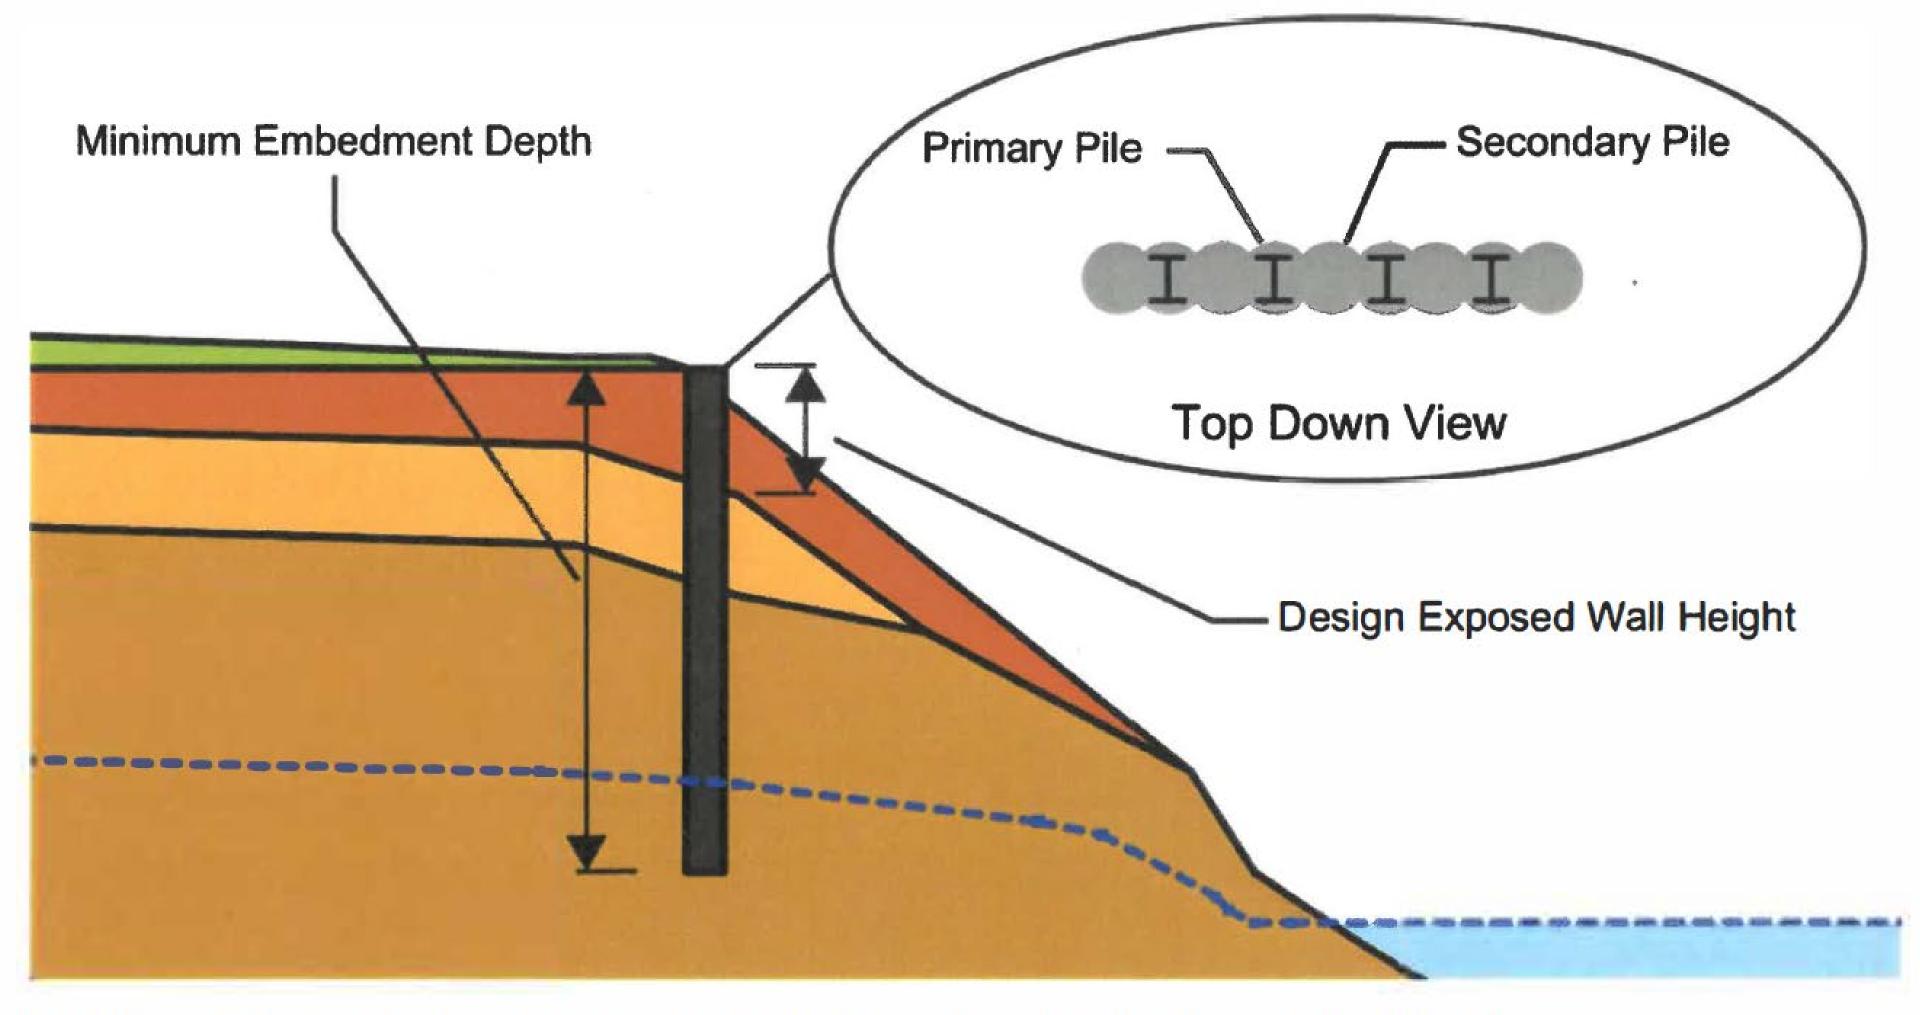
Conceptual rendering of secant pile wall system implemented at the site.
